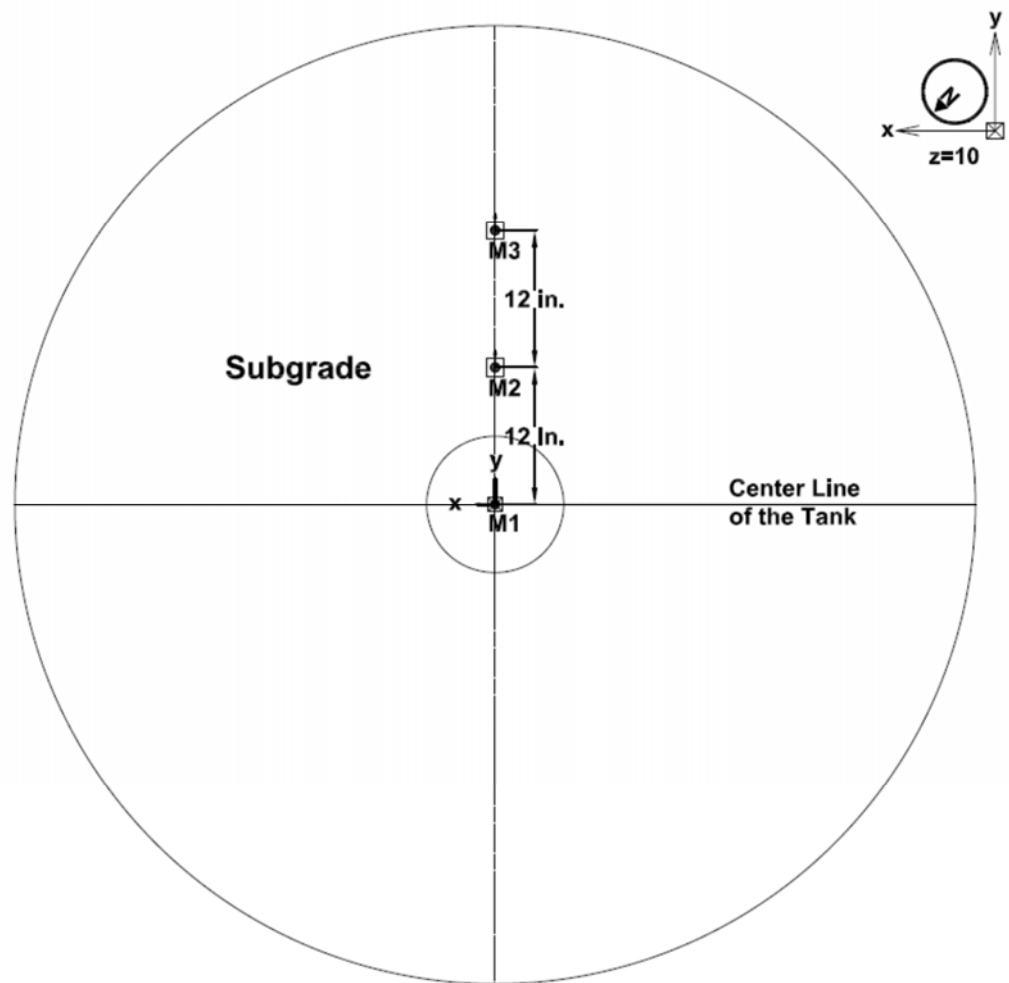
Instrumentation plan for experiment No. 2—Plan view, $Z = 10$ inches
